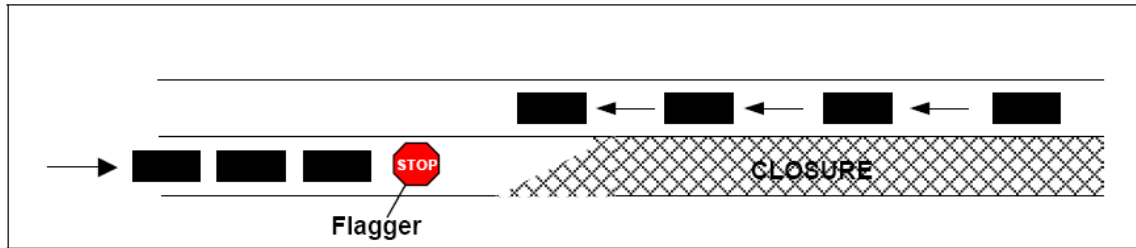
Example of a flagging construction zone [Adapted from IBI 2007]
